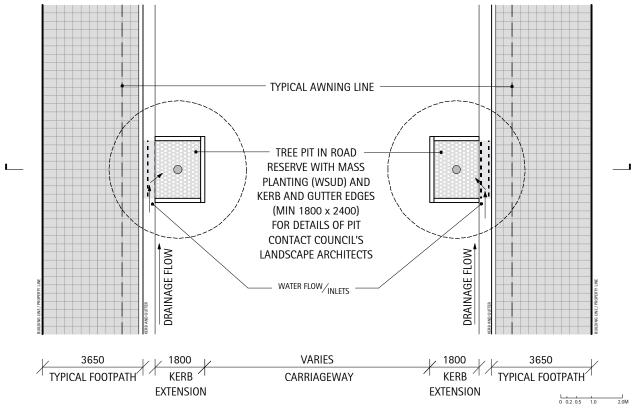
Street Tree Typical WSUD Pit Location in Roadway
